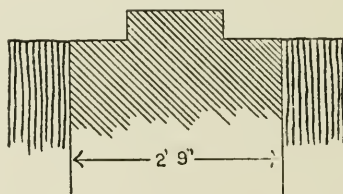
SECTION OF WALL AND DOOR SILL BETWEEN ROOMS 2 AND 8.
